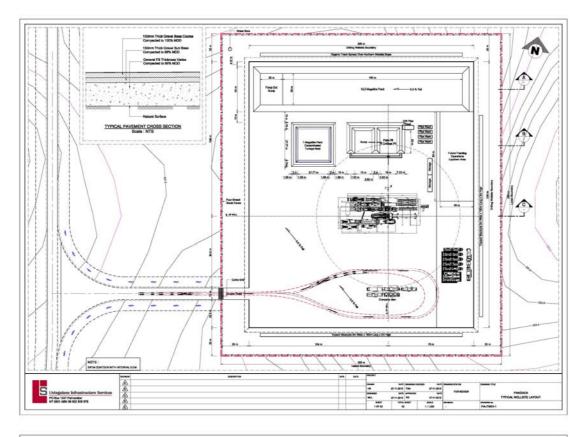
Erosion & Sediment Control Plan - Drill Pad 1
